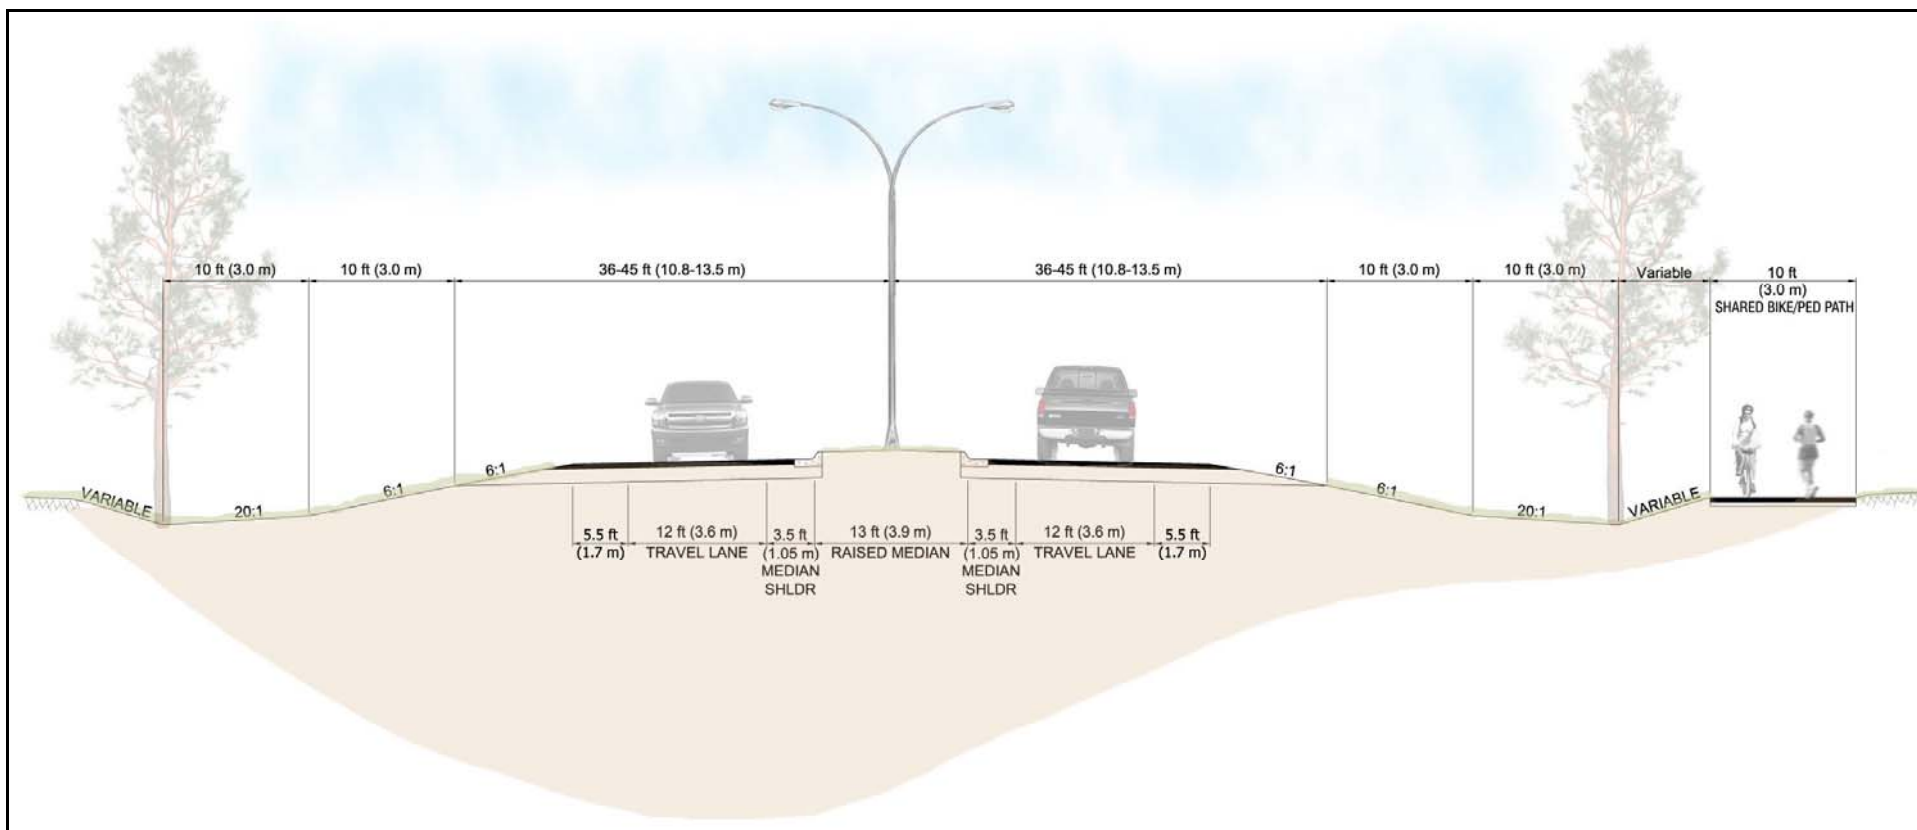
, Developed Limits of Red Lodge to Two Mile Bridge Road
